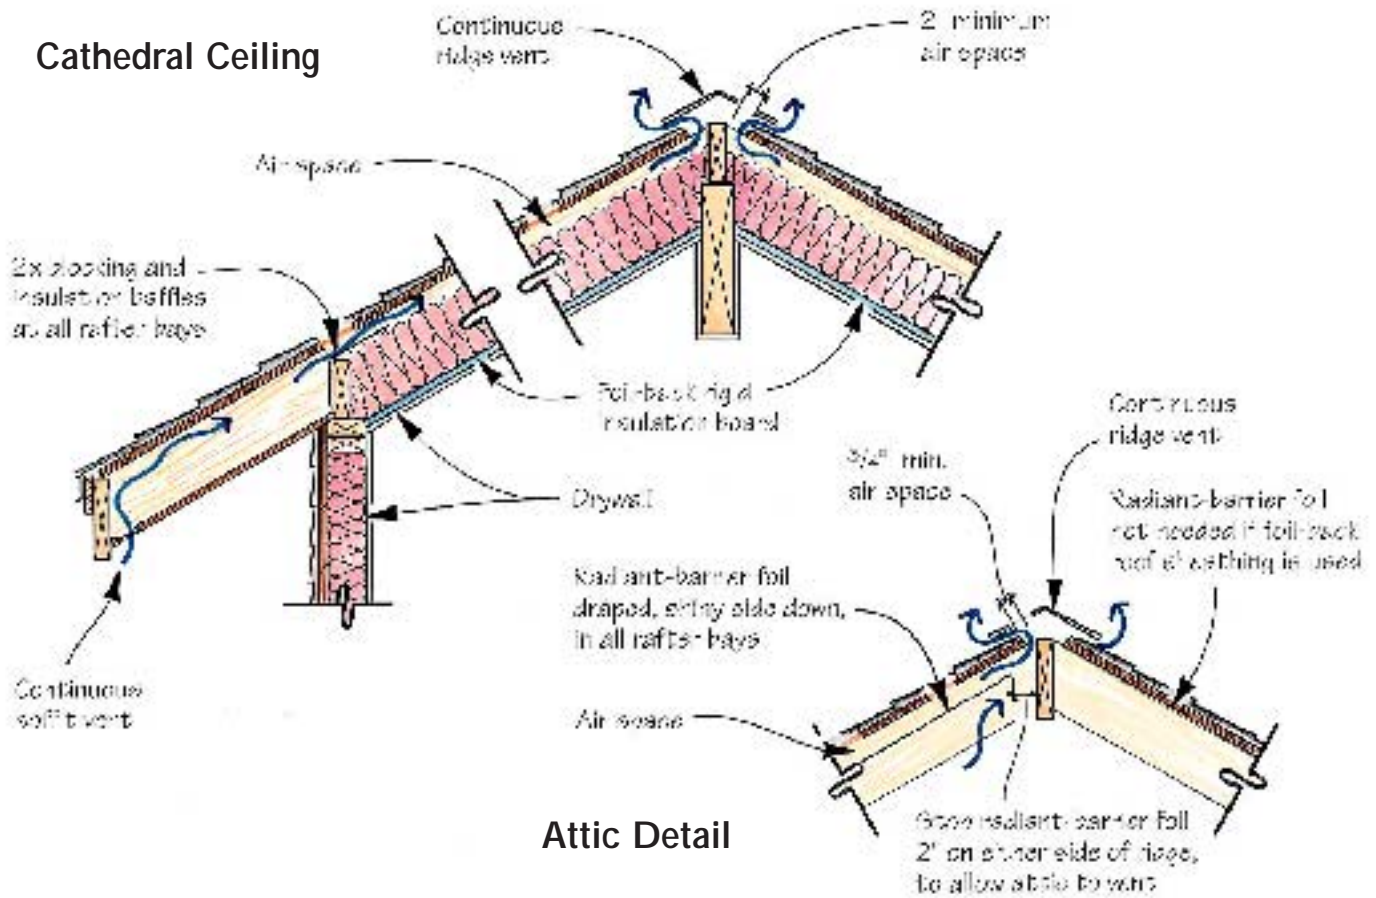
The author recommends doubling the net ventilation area in both attics and vaulted roofs. He prefers passive venting to power vents, which may draw conditioned air out of the living space.
